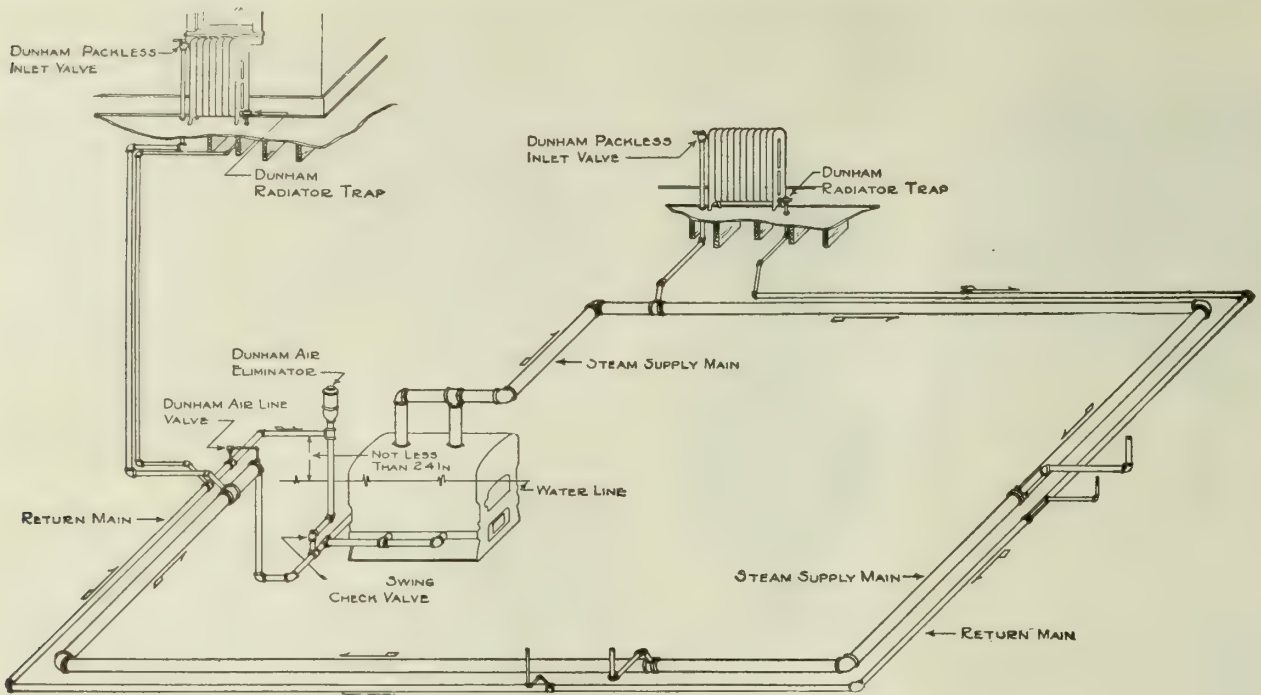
TYPICAL PIPING PLAN, DUNHAM HOME HEATING SYSTEM
